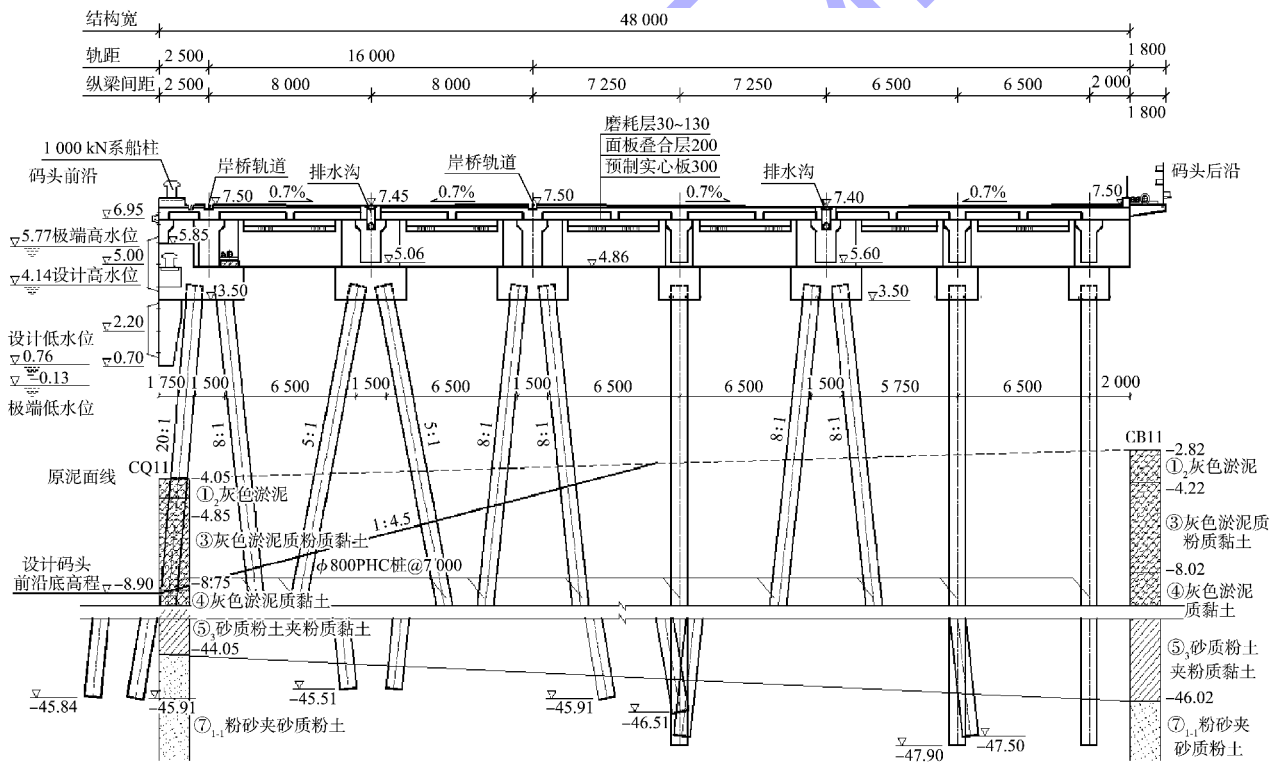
Structural cross-section of 10,000 DWT inner berth (dimension: mm; elevation: m)
